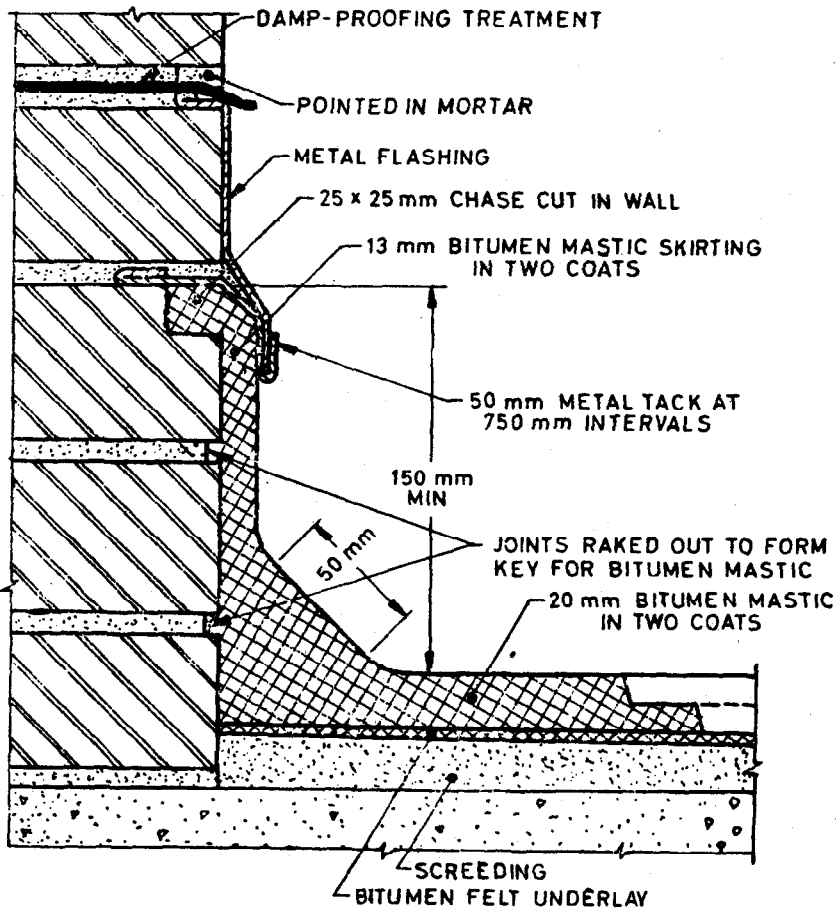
BITUMEN MASTIC LAID ON SCREEDED ROOF AND BITUMEN MASTIC SKIRTING TO BRICK WALL
